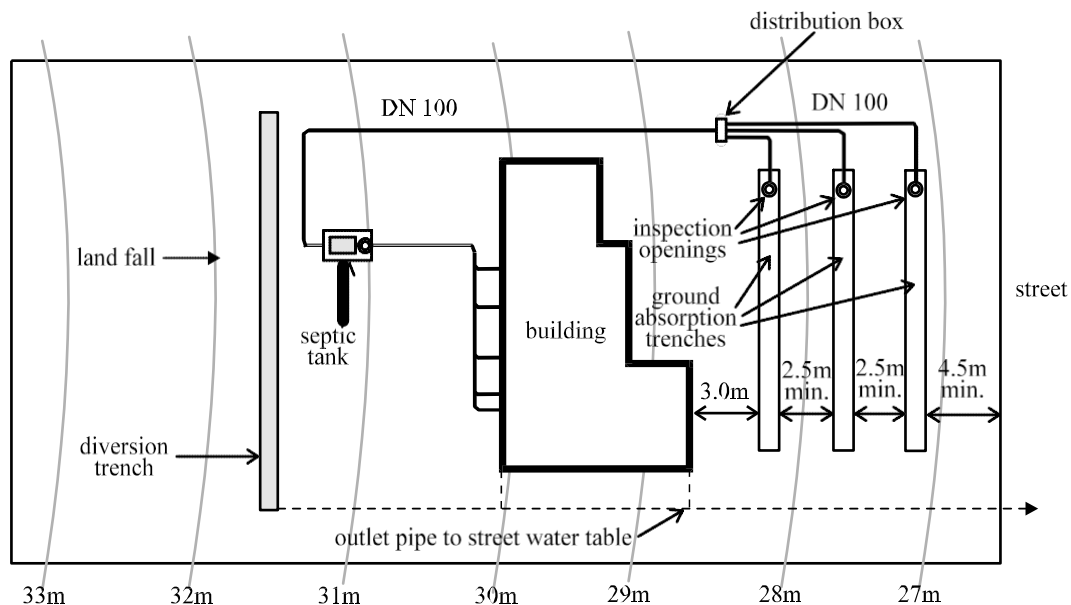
DIVERSION / ROOF WATER DISPOSAL LAYOUT
